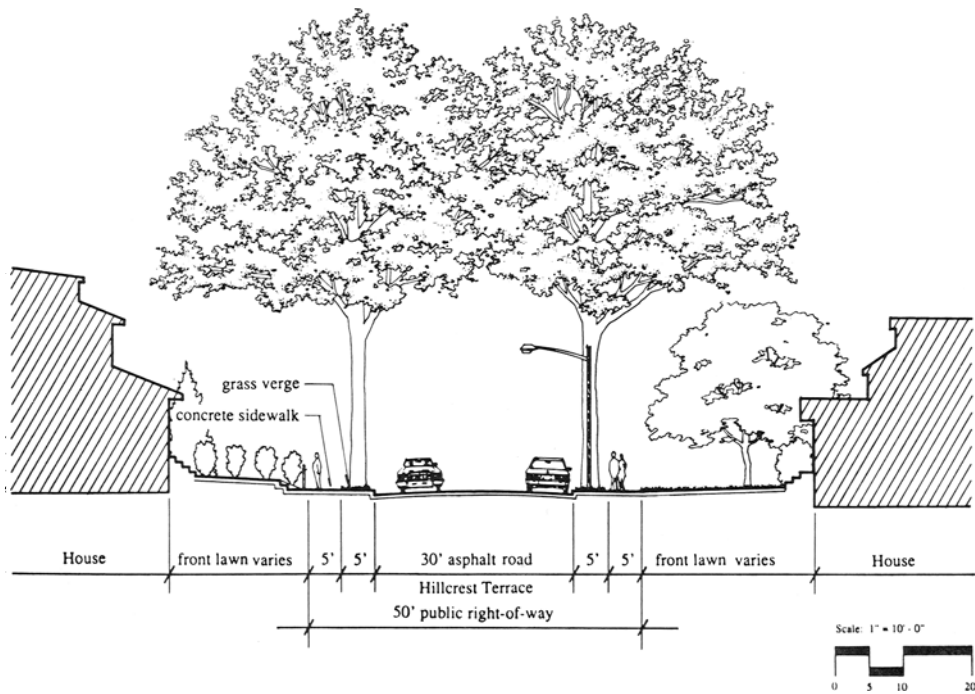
Trees placed between sidewalk and street clearly define and separate pedestrian space from vehicular space. (Source: East Orange Urban Forestry Demonstration Project: Findings and Recommendations)
